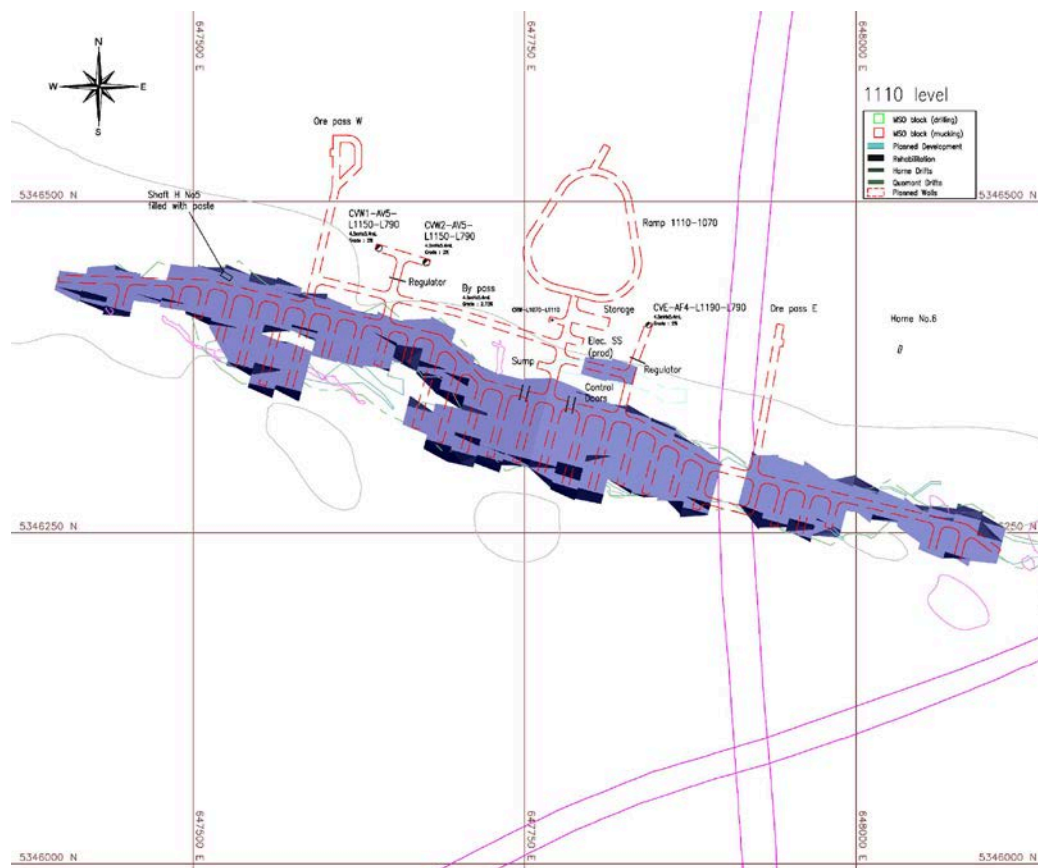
Typical production level – general arrangement with storage and level in ore
